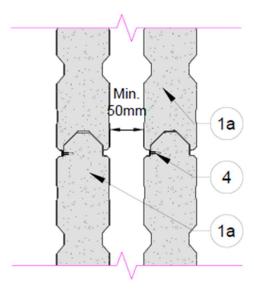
Plan view of 2  $\times$  78 mm Speedpanel with minimum 50 mm cavity
